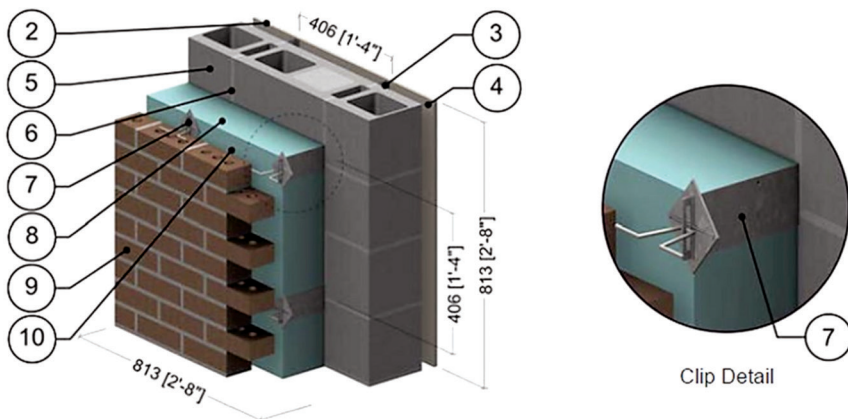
Concrete-block brick-veneer wall assembly.⁵
